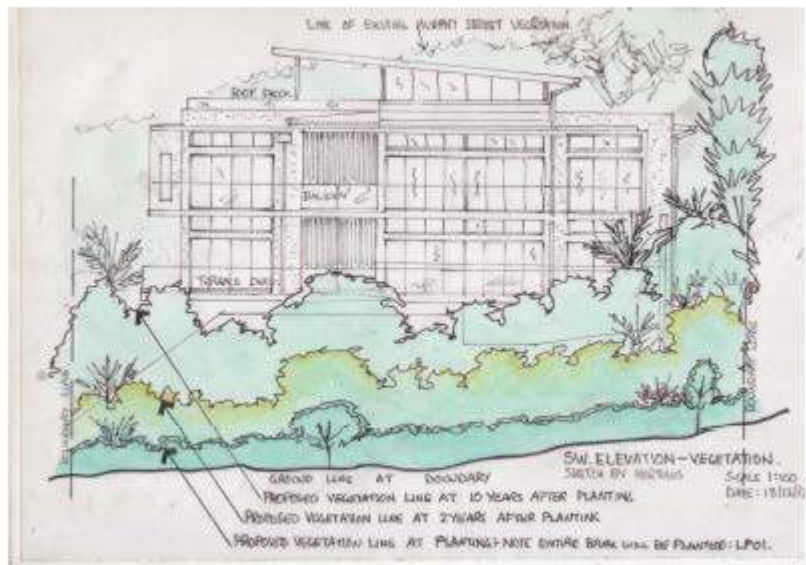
South West Vegetation Elevation at planting, 2years and 10 years.
